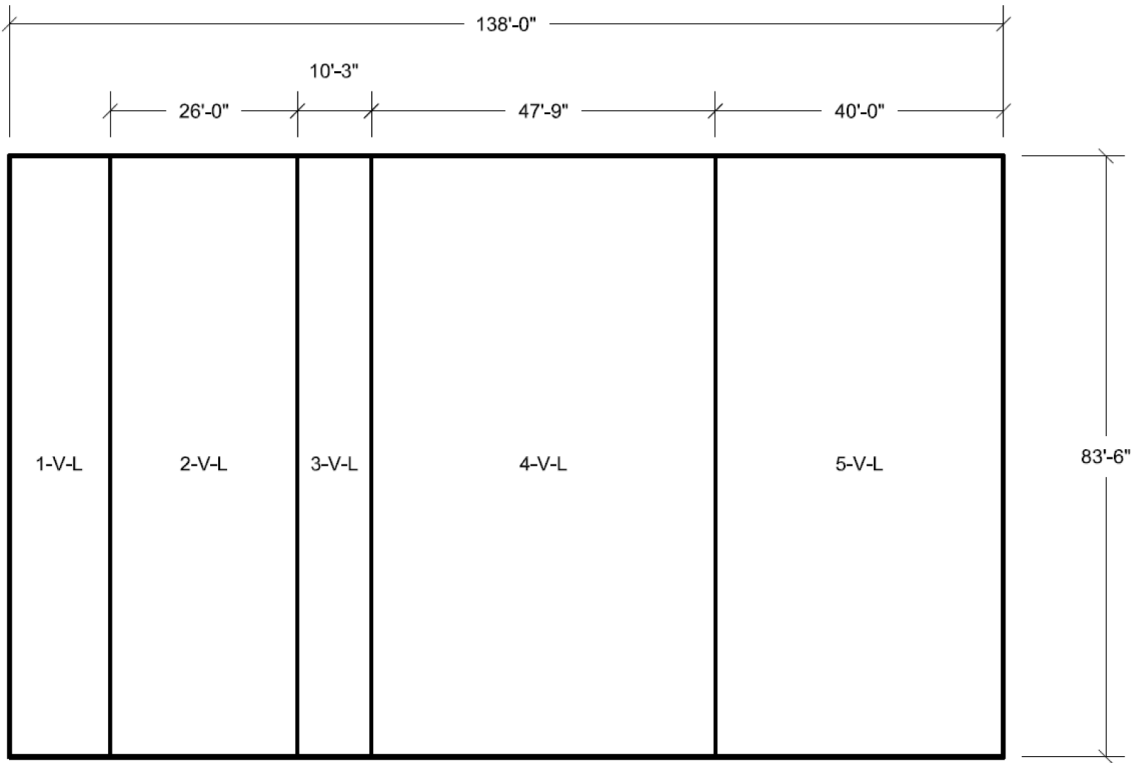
H.6-98 UHS Basin West Wall Looking East Vertical Reinforcement Zones Near Side Face
